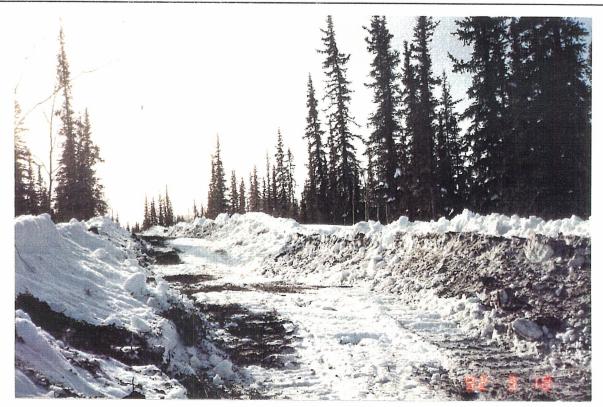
View looking south from station: 2 + 400 (Neg # 5A)
